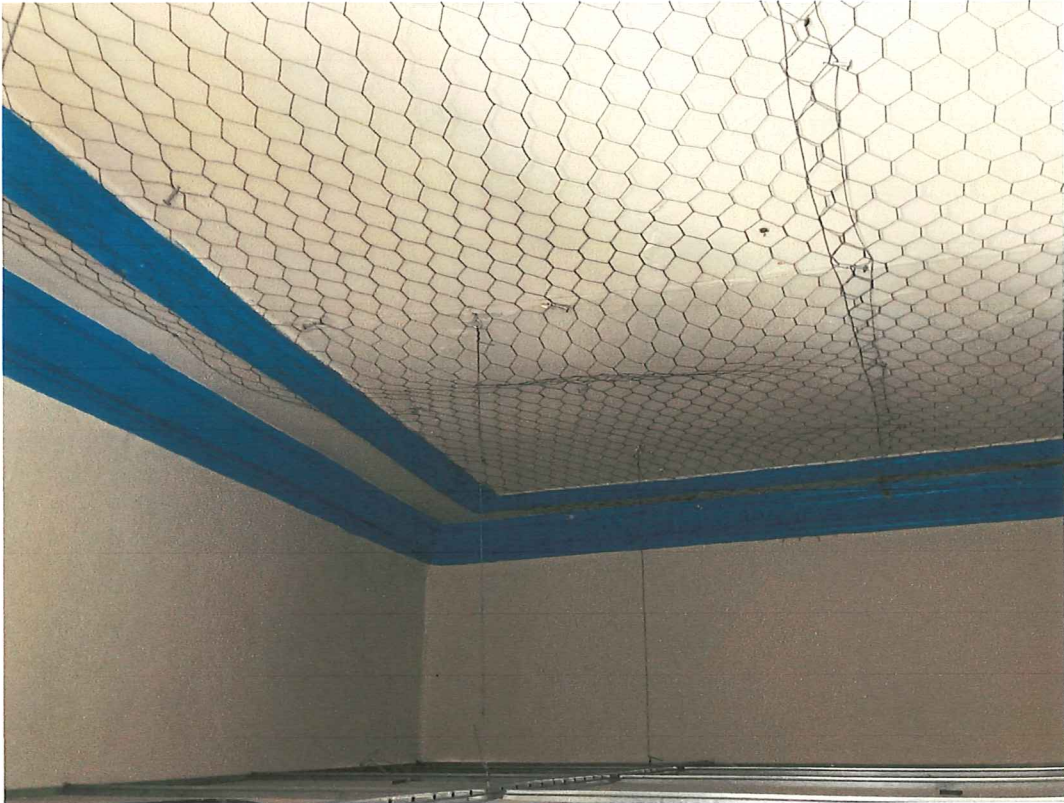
Netted lath and plaster ceiling hidden above the modern suspended ceiling.
